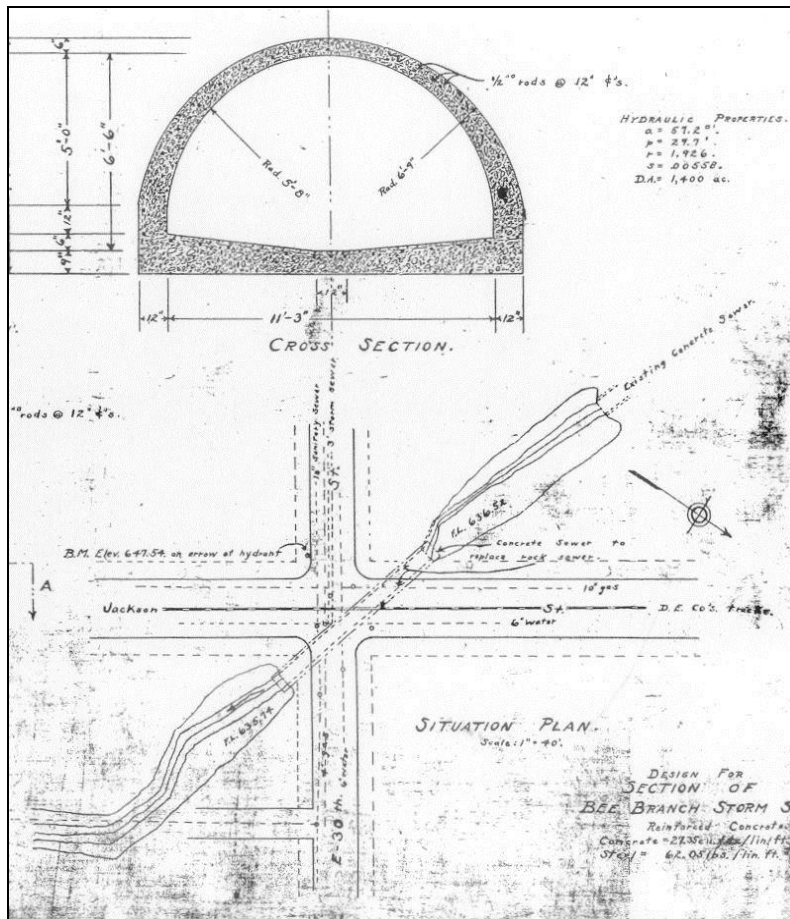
New concrete culvert at 30th and Jackson streets, March 1924
